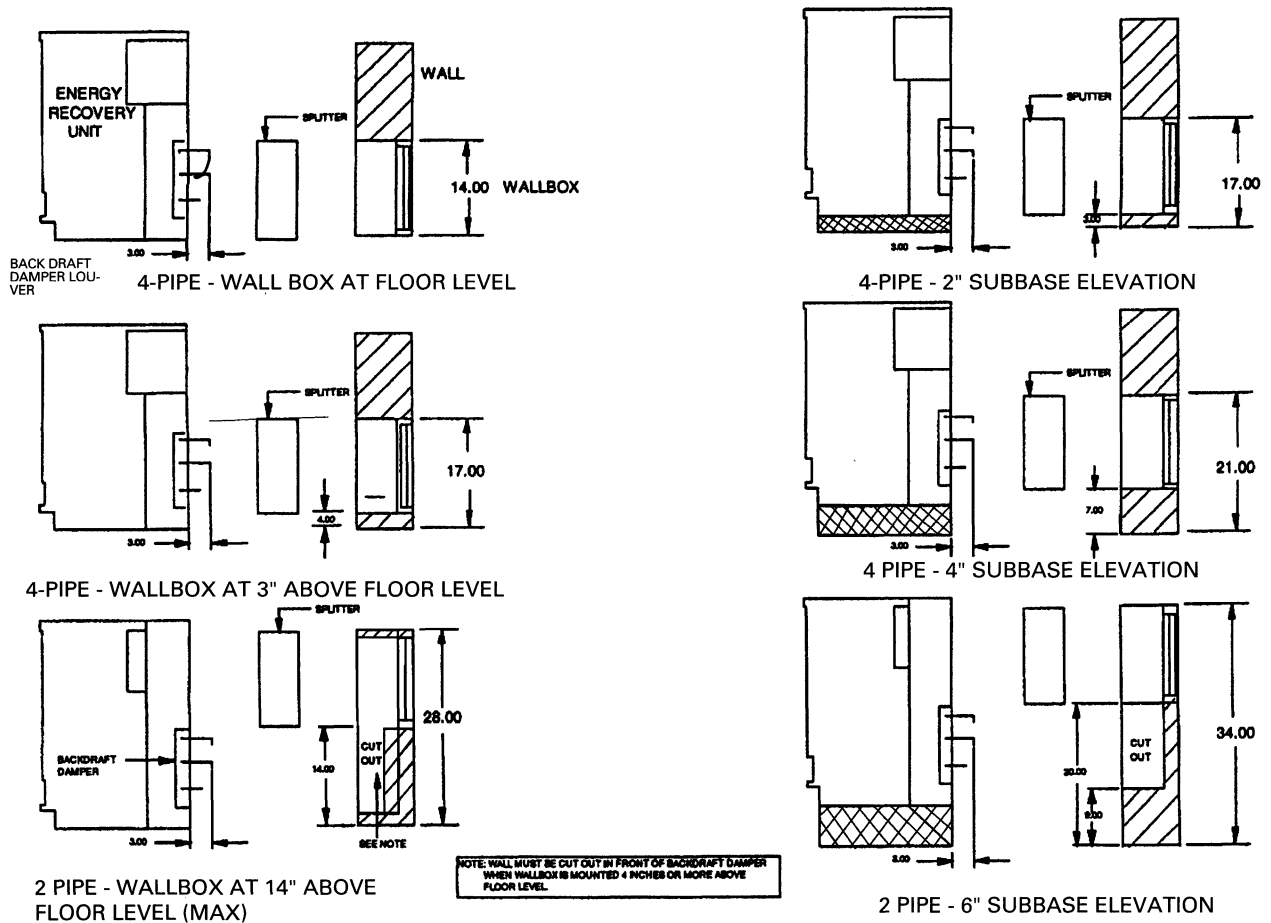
WALLBOX INSTALLATION (ALL POSSIBLE INSTALLATIONS NOT SHOWN)
